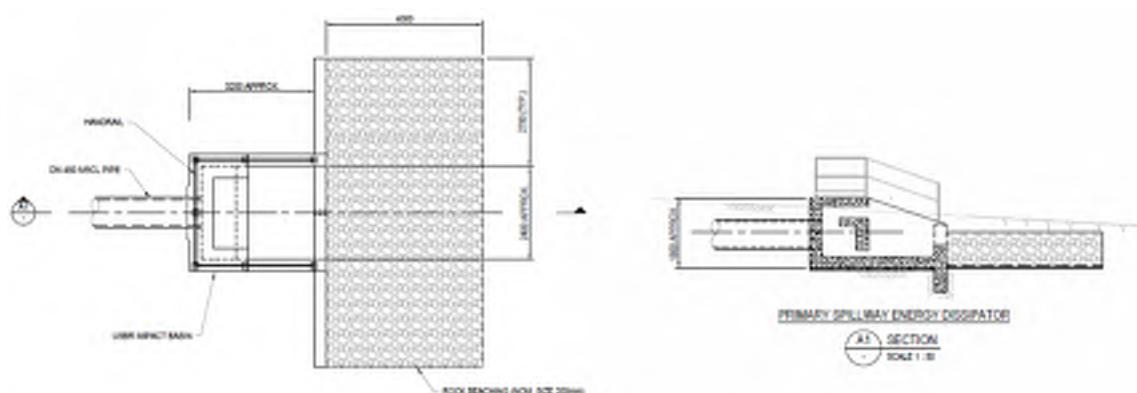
Plan (left) and section (right) of Energy Dissipator
